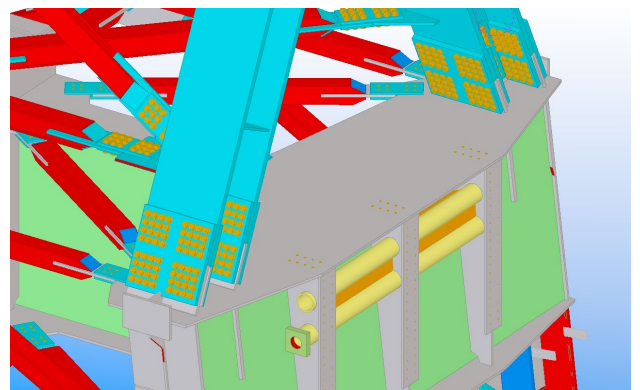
Connections for the temporary pier at the pier cap, anchor structures for longitudinal stays on the side of the pier cap
